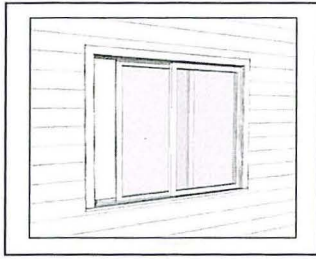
Window Detailing – Trim and casement location and dimensions
